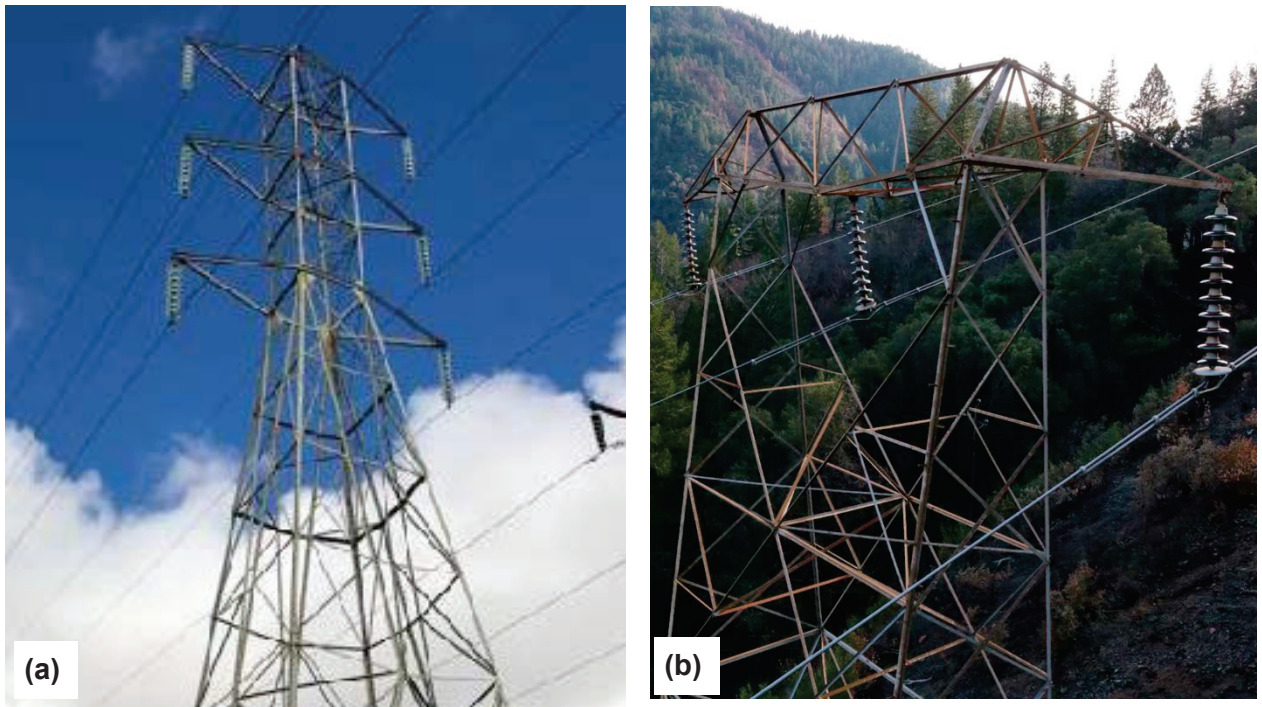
Examples of (a) a double-circuit vertical configuration tower used at elevations below approximately 1,000 feet and (b) a single-circuit horizontal configuration tower used at elevations greater than 1,000 feet.
